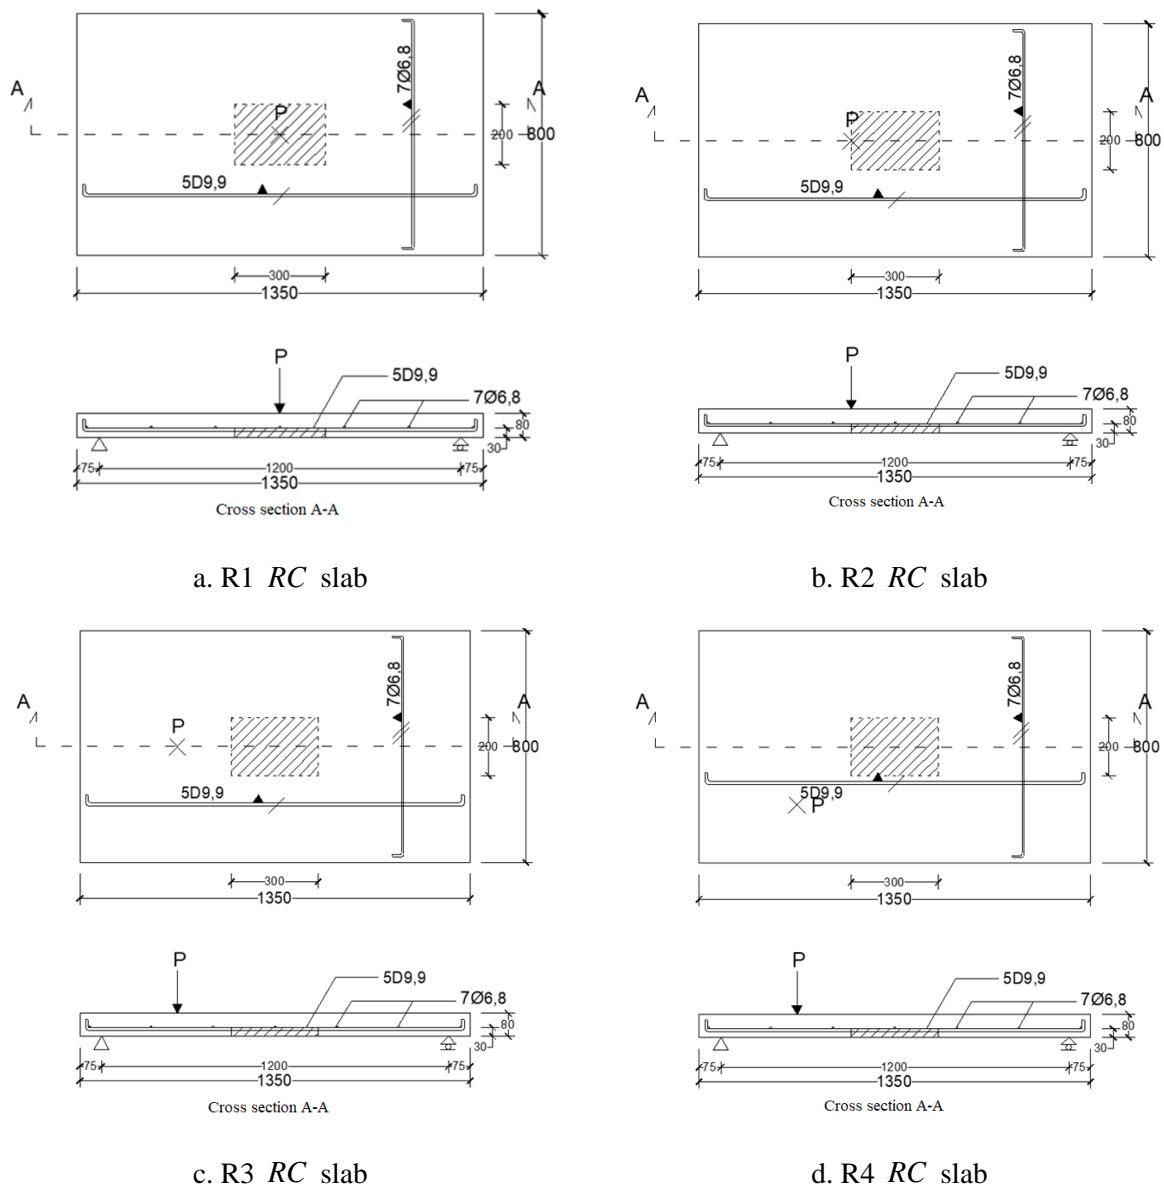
Reinforcements layout of patched *RC* slabs and their loading point *P*.
